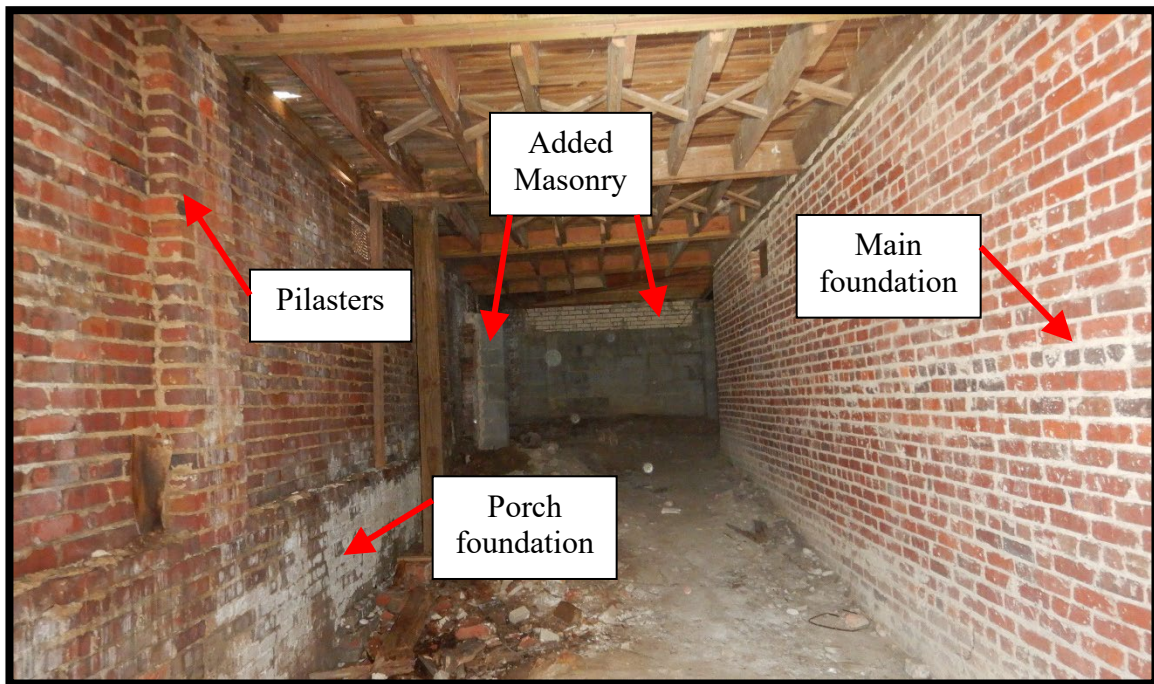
This is along the right side. The main structure foundation is 12" solid brick and the porch foundation is 4" brick with pilasters and 8" foundation brick.
